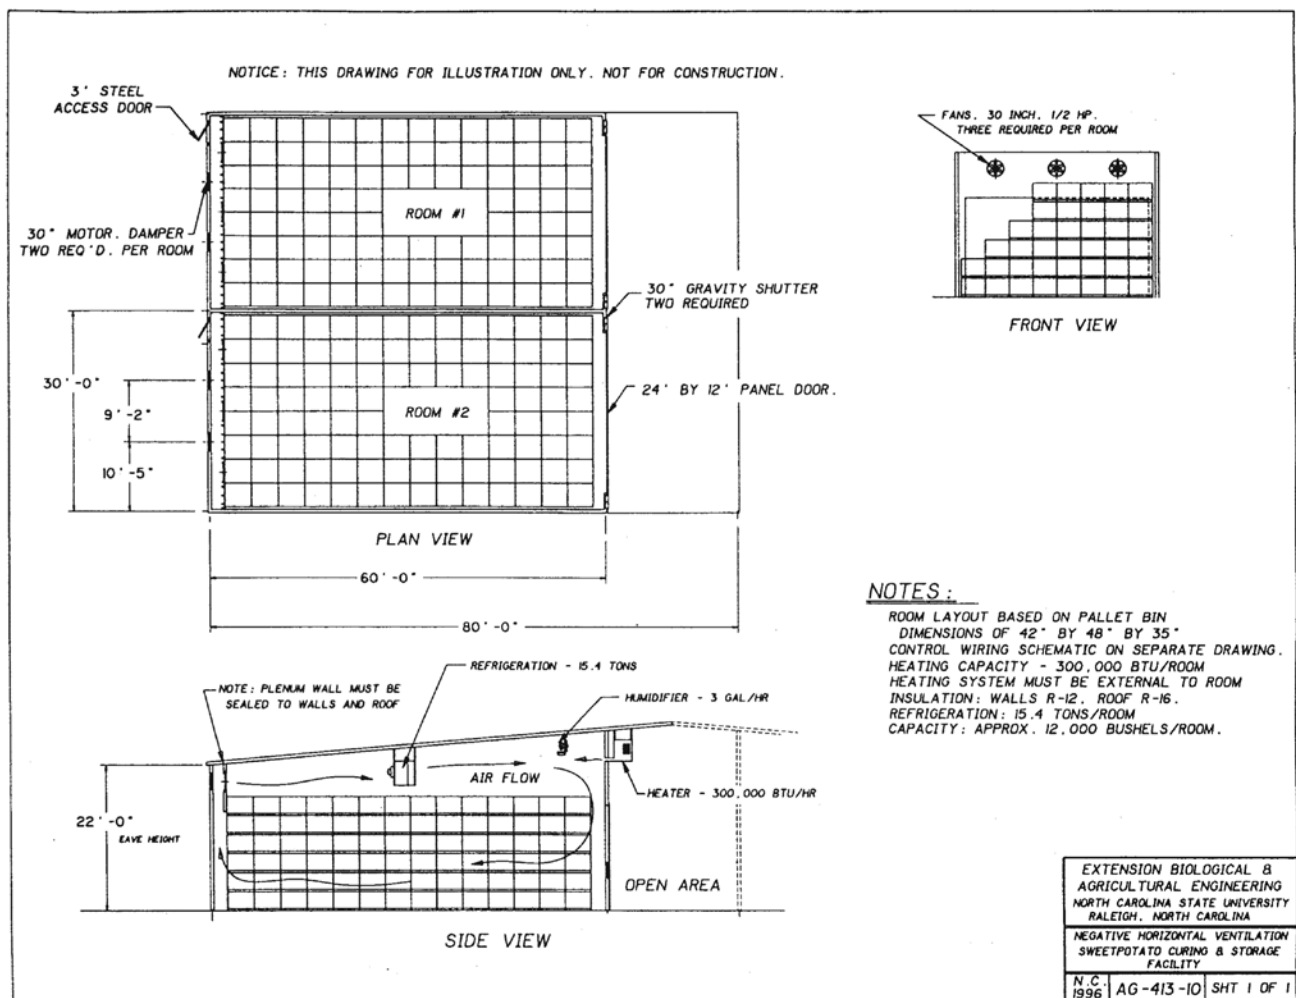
Construction diagram for negative horizontal ventilation storage facility. (ILLUSTRATION BY M. BOYETTE)
